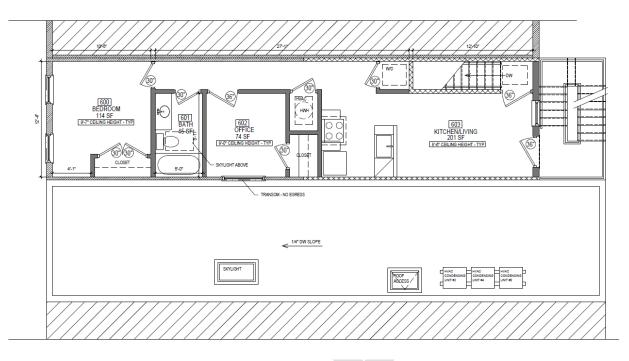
46-48 S. Carrollton Avenue – Proposed fourth floor plan
